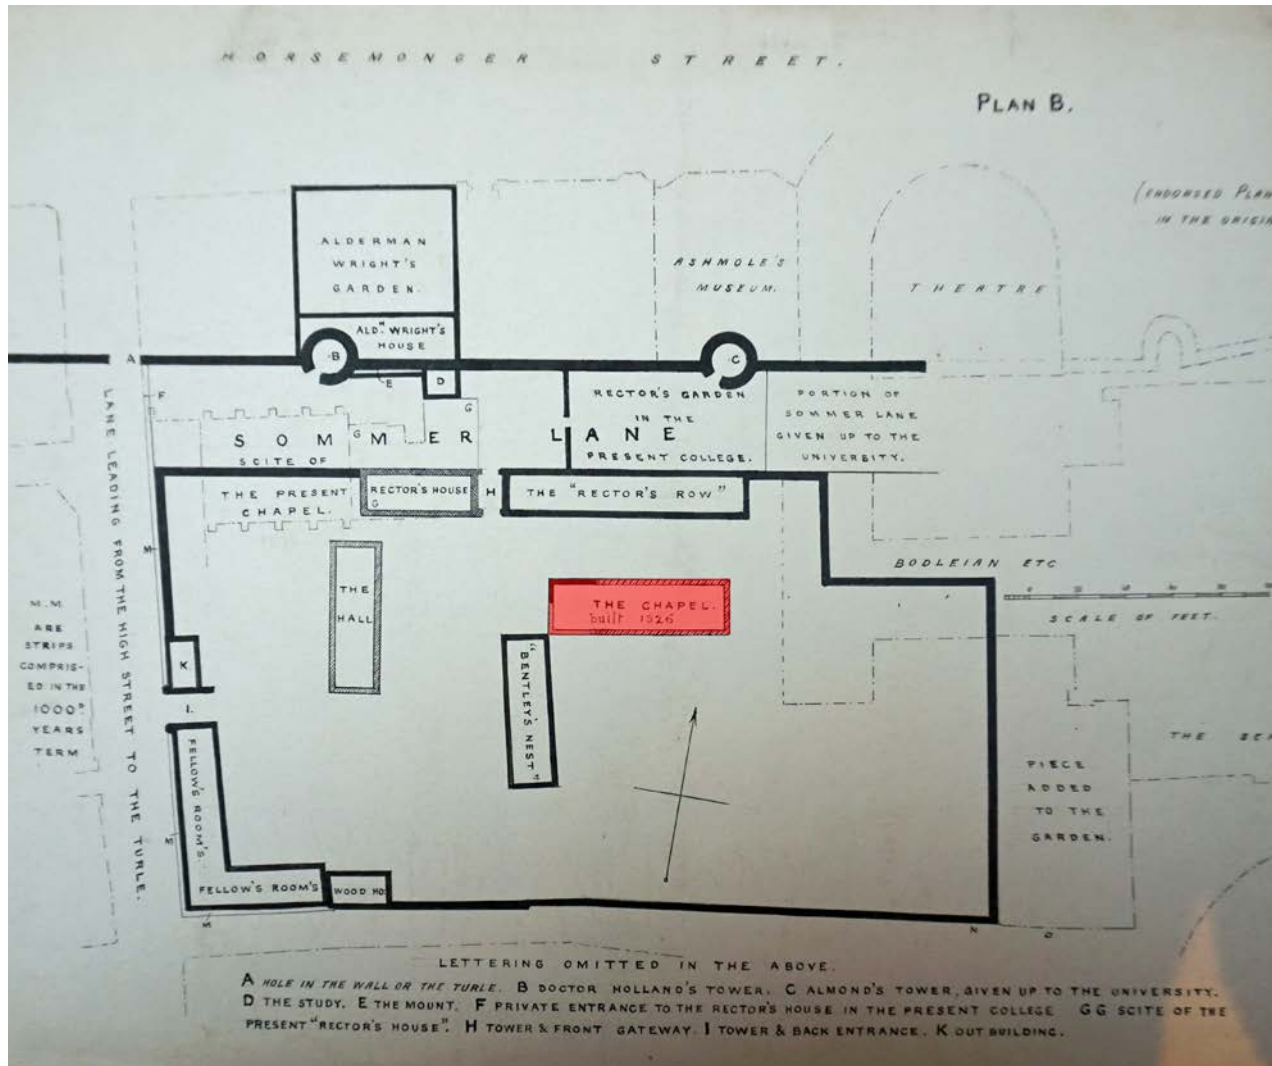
c.1350 site plan showing the location of the first Chapel and Library of Exeter College (Exeter College Archive)
